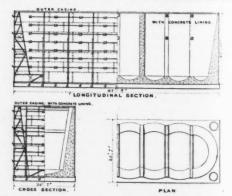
Details of Caisson for 3,000-ton Concrete Block in Breakwater Foundation.
